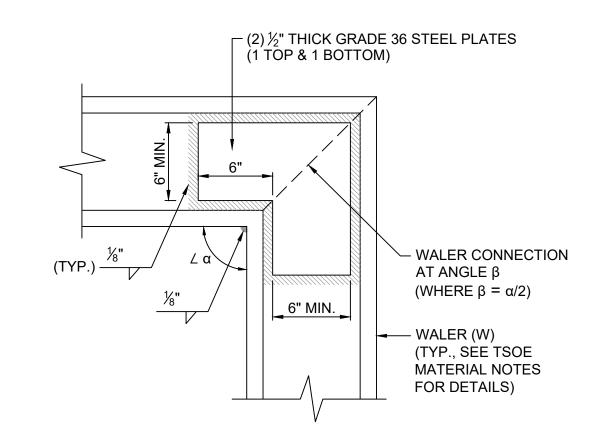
DETAIL: TYPICAL SHEETED PIT EXCAVATION
